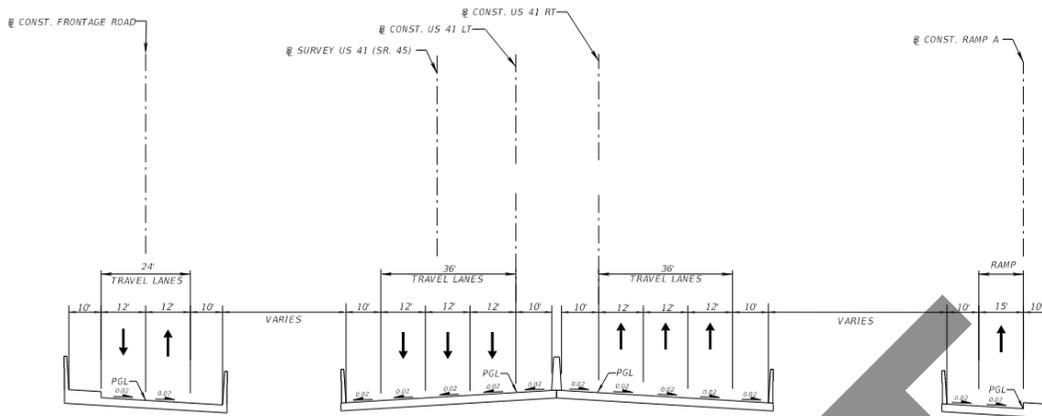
Bridge Typical Cross-sections over Delaney Creek
